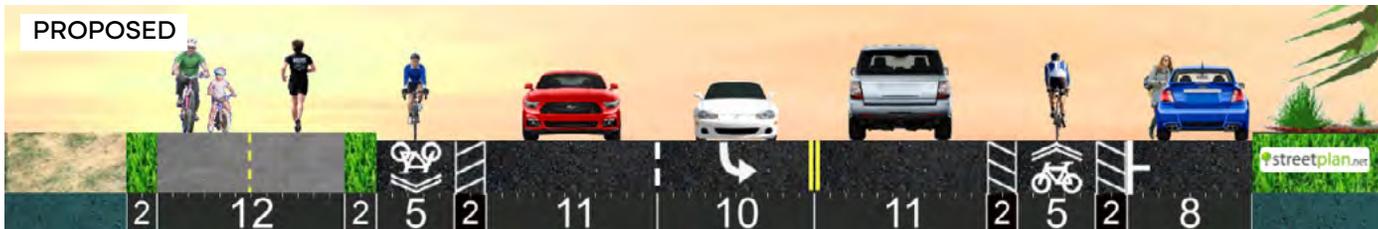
Concept: LOVR between Ravenna Avenue and Palisades Avenue
